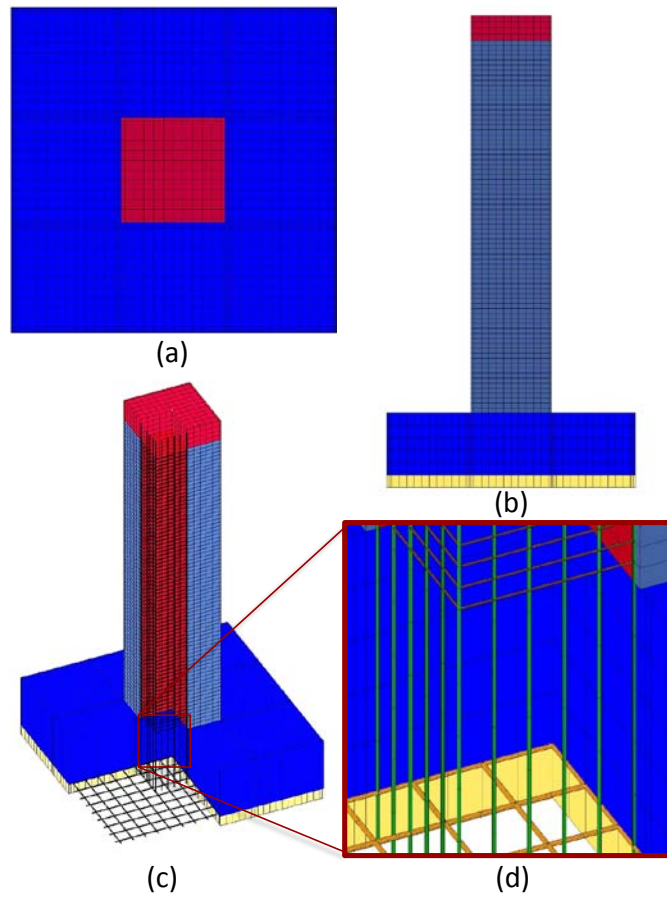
Plan (a), elevation (b), isometric cut-through (c), and reinforcement detail (d) of square pier.
